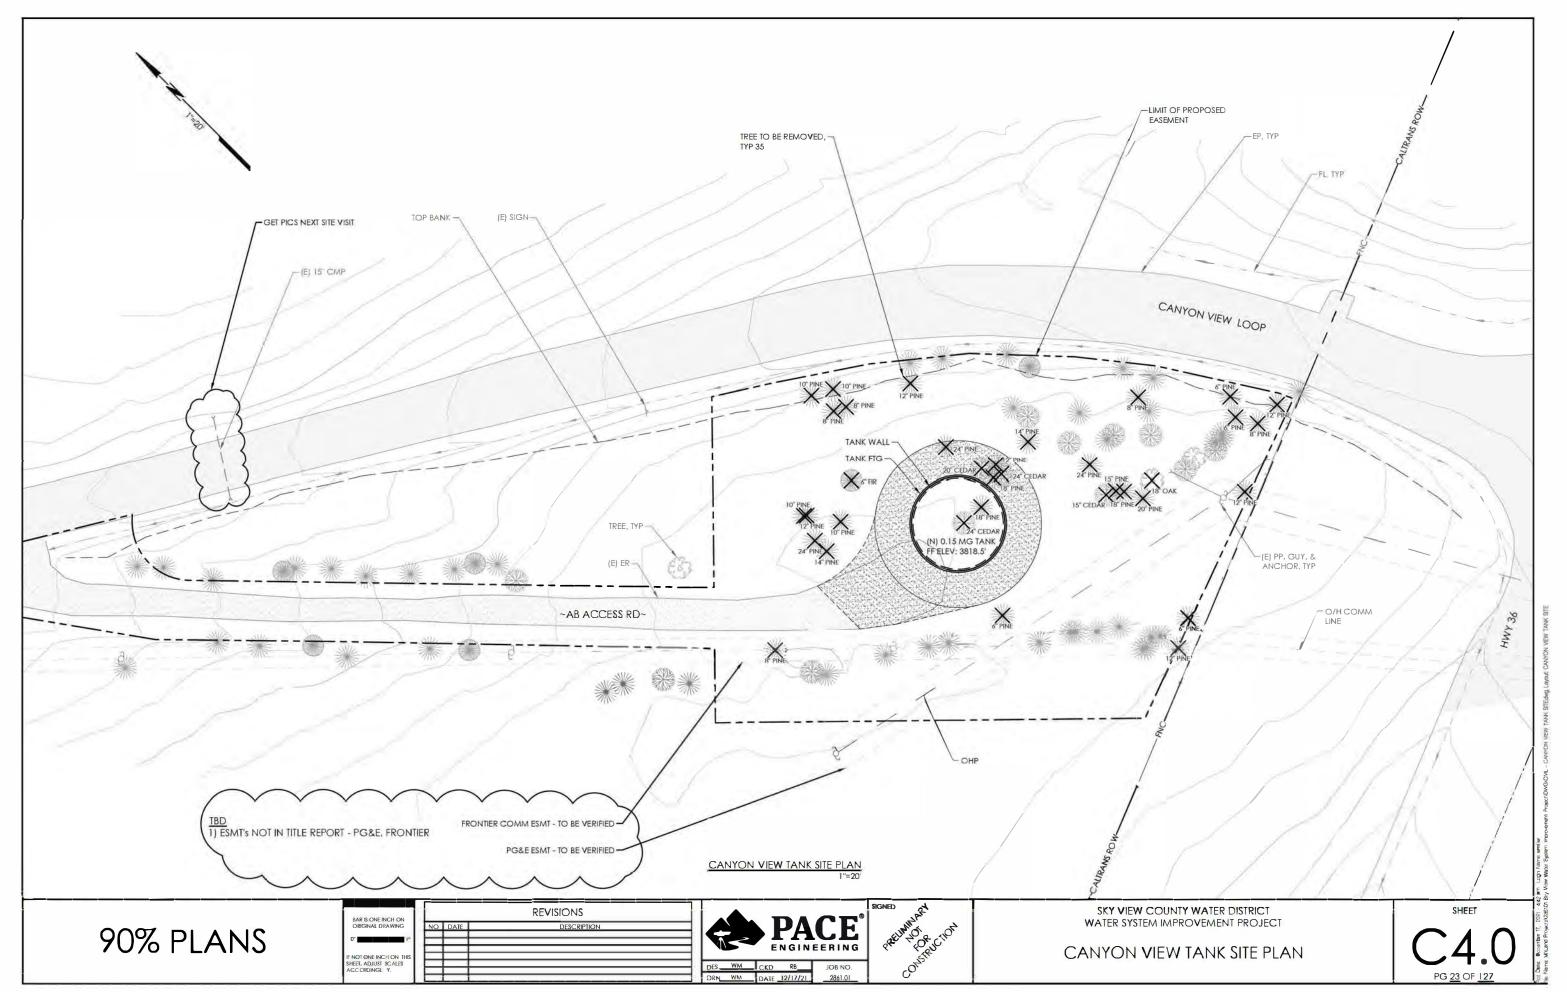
Canyon View Loop Tank Site - Proposed Improvements
